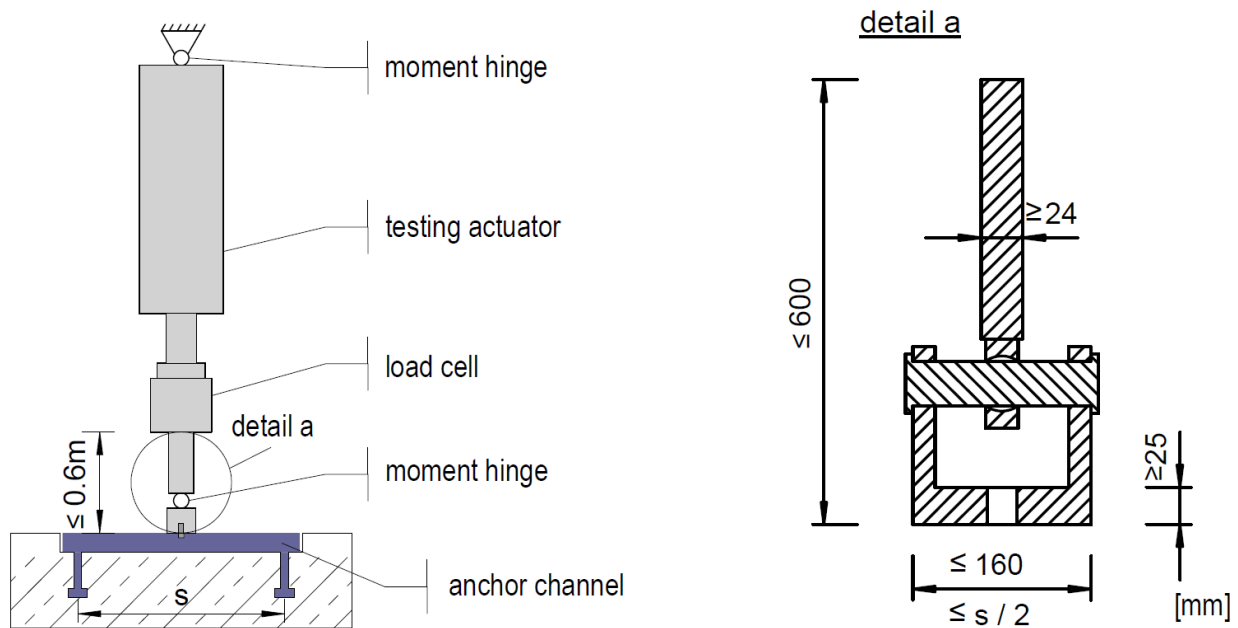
Example of test setup including two moment hinges and dimensions of tension rod and loading fixture
